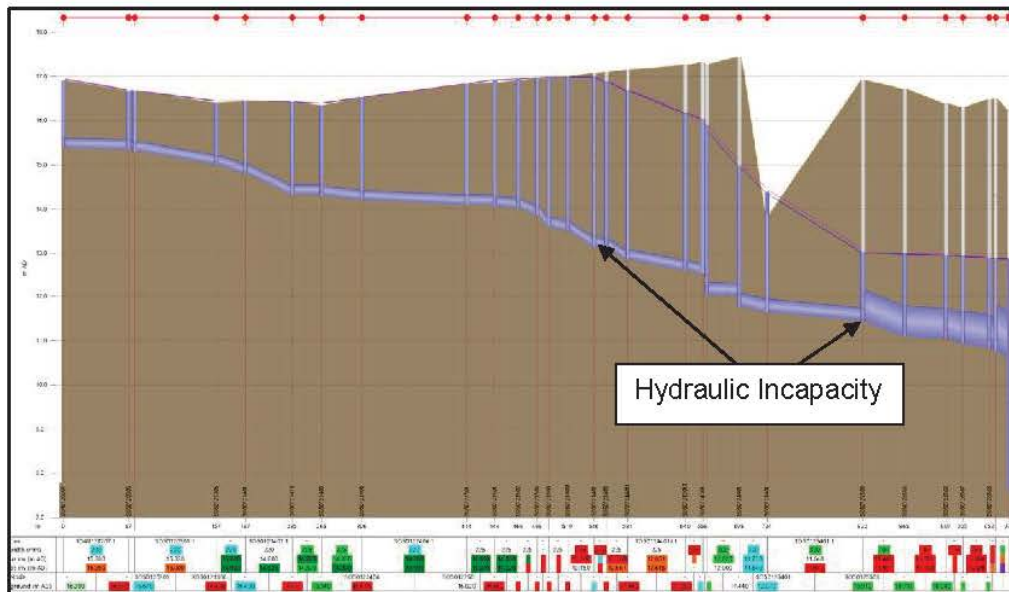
Long section from River Monnow Crossing to Wonastow Road
